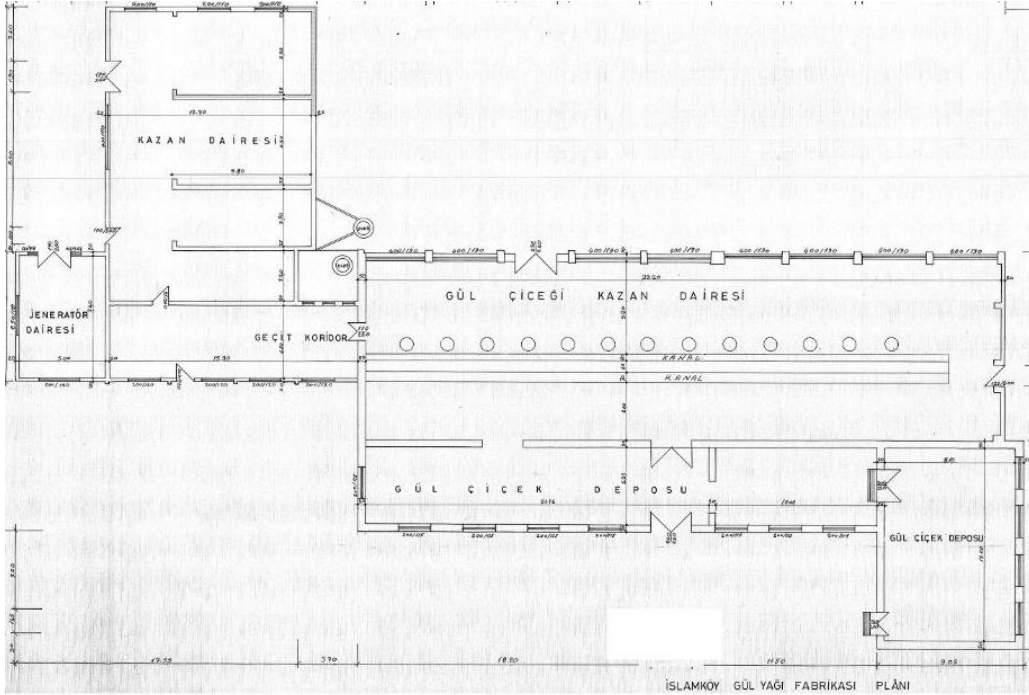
İslamköy Rose Oil Factory Ground Floor Plan.
